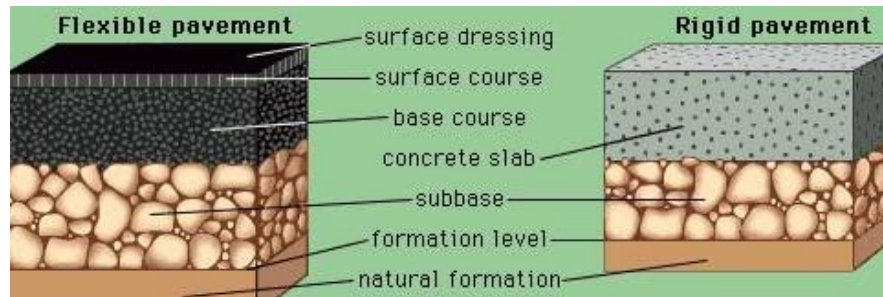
Typical section of flexible (left) and rigid pavement (right) (Rigid Pavement 2017)
